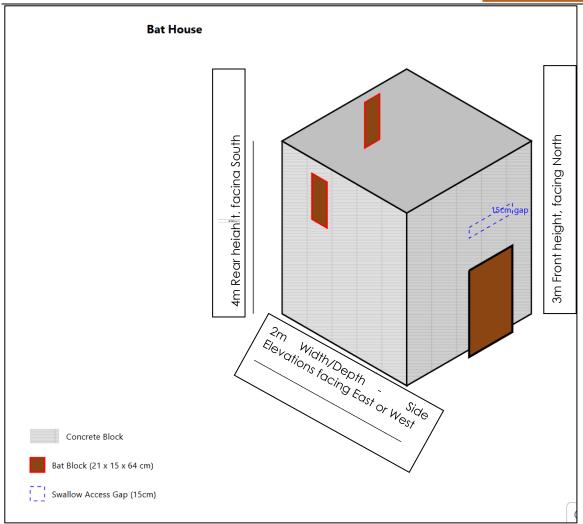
Dedicated Block Bat House Structure will be constructed to provide alternative roosting opportunities for bats
